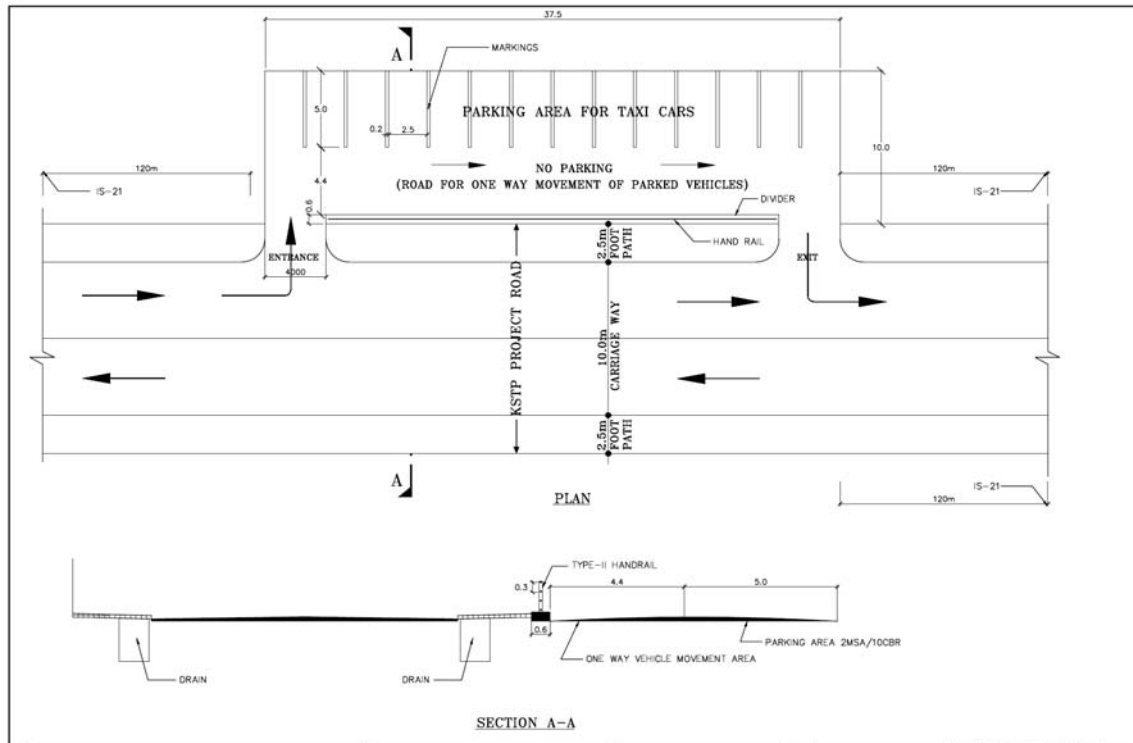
PROPOSED PARKING AREA DESIGN FOR TAXI (CAR / JEEP)
